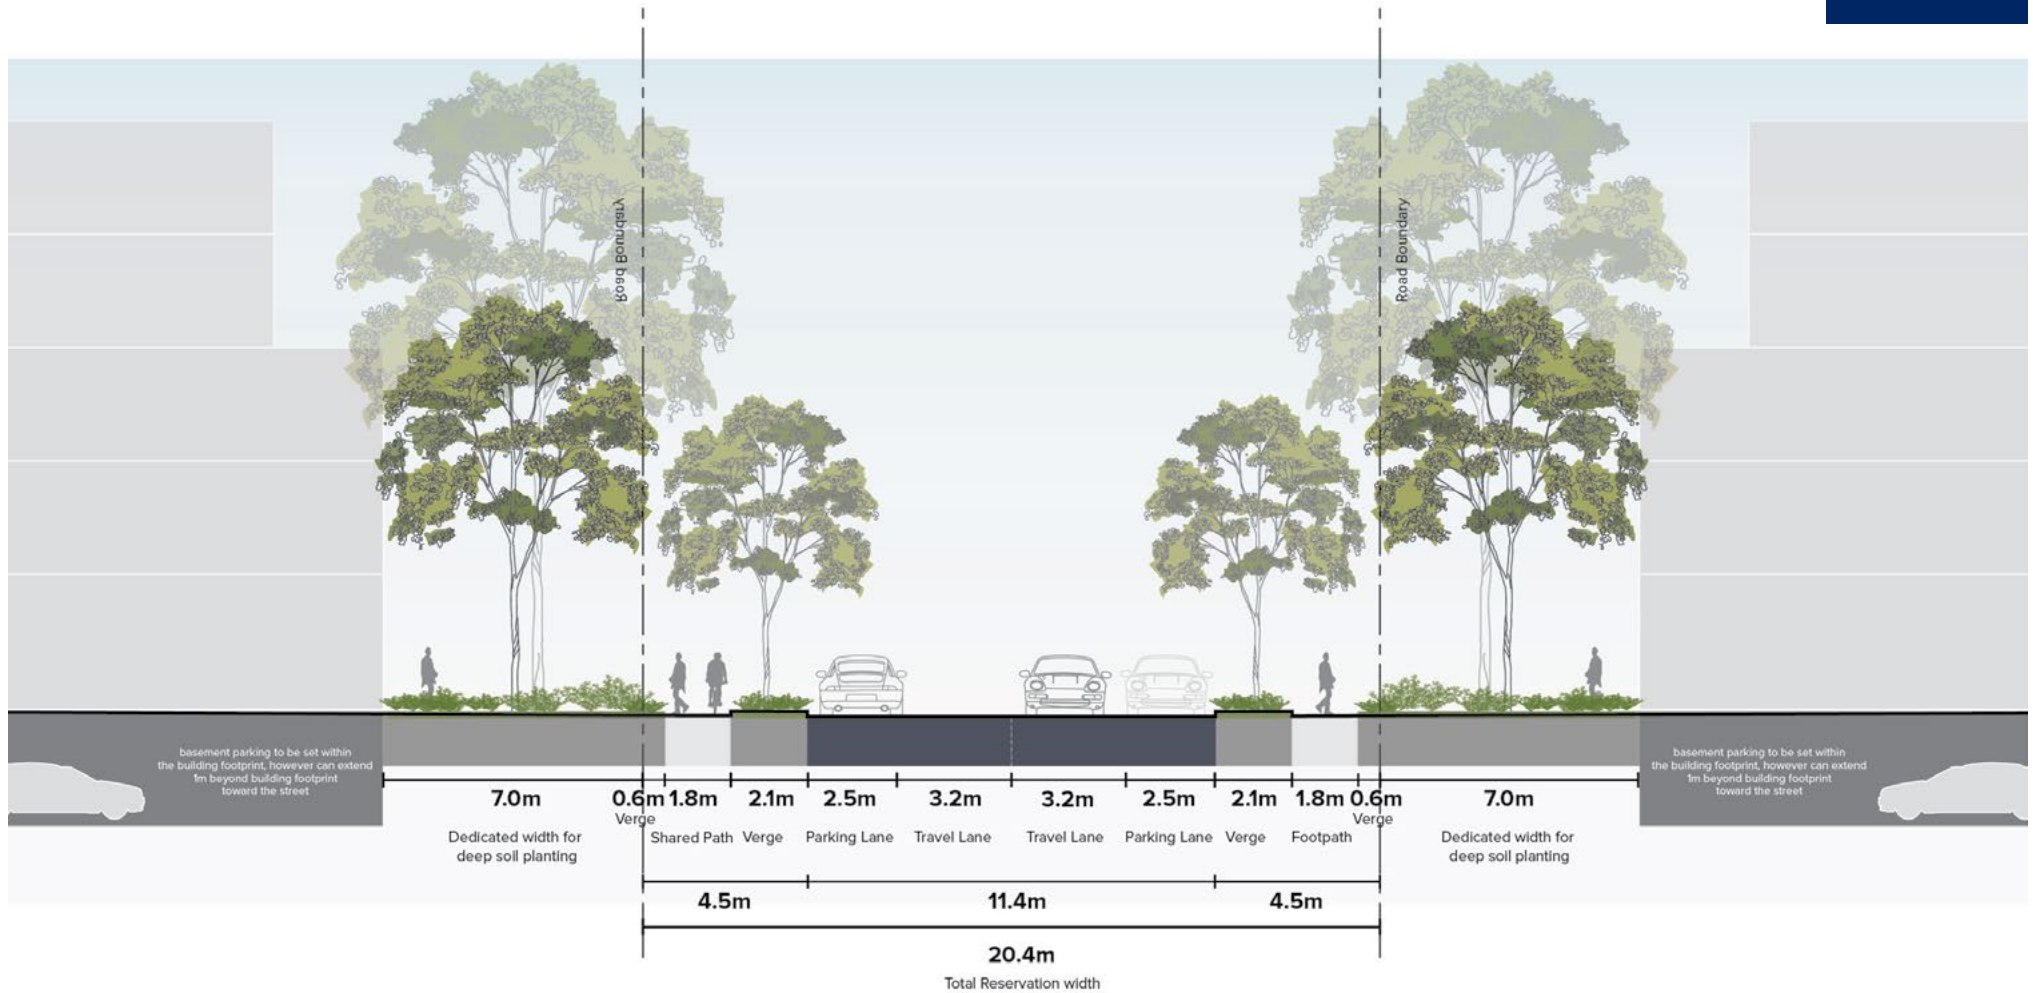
Typical primary street –indicative street section. Credit: Hatch RobertsDay.
